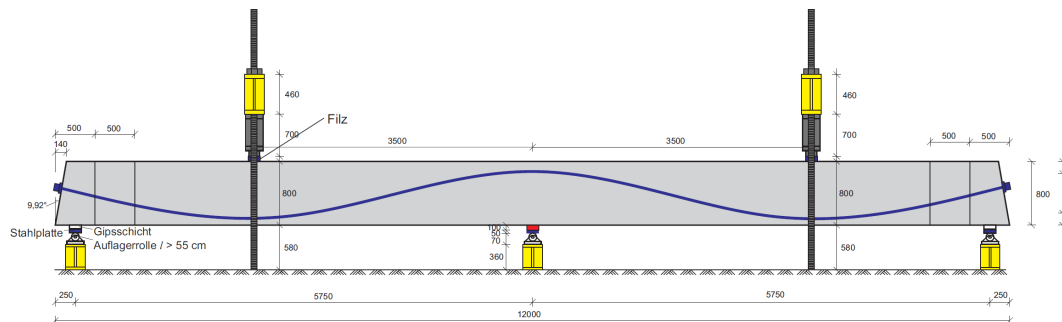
Experiment setup for girders 1.1, 1.2 and 1.3 with two single loads applied to the girder. The girder is resting on three bearing points. (Image created by RWTH Aachen)
